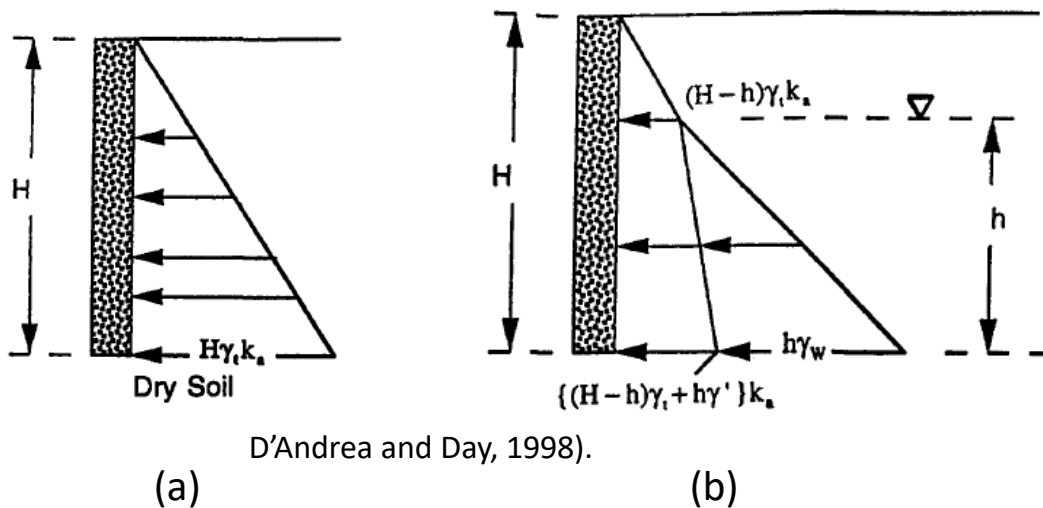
Target loading conditions (a) Dry backfill (b) Submerged backfill
